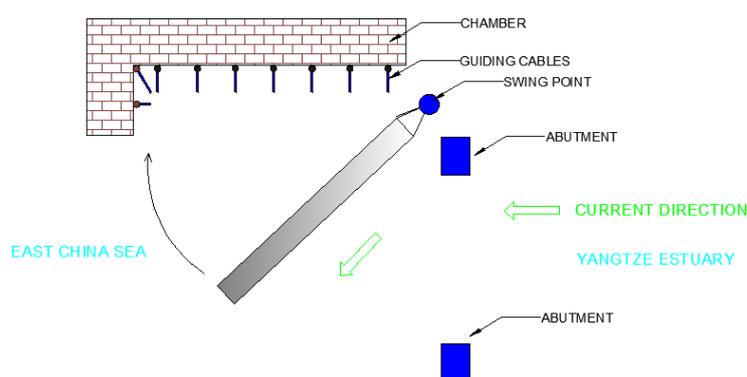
10. Plan view of floating gate after storm condition, not to scale
